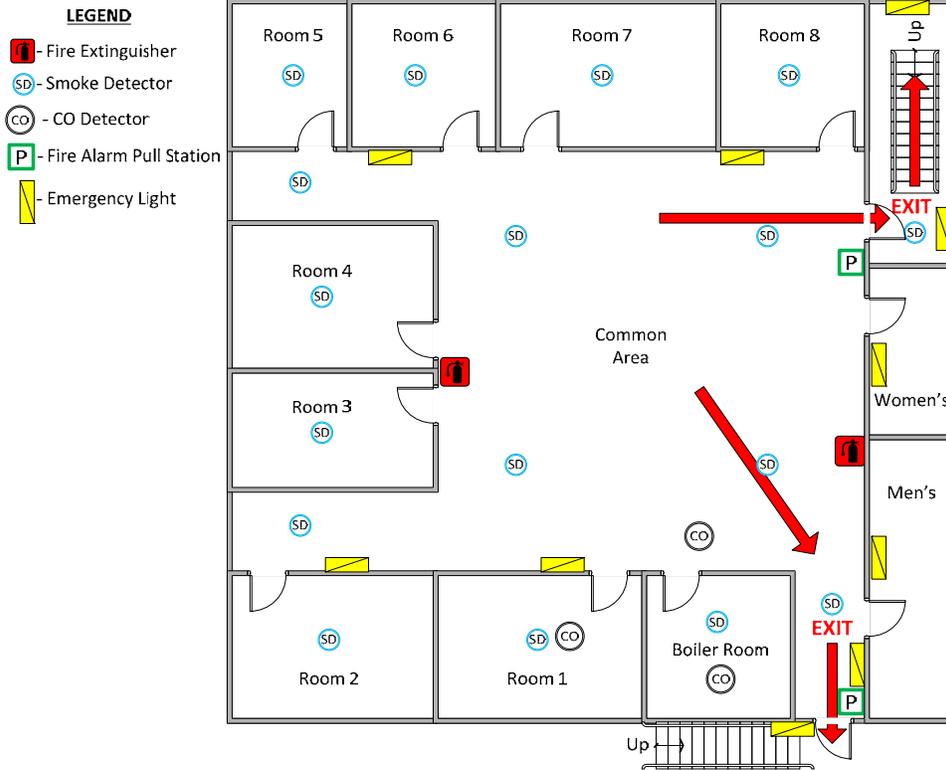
Bunkhouse Second Floor Plan and Evacuation Routes
